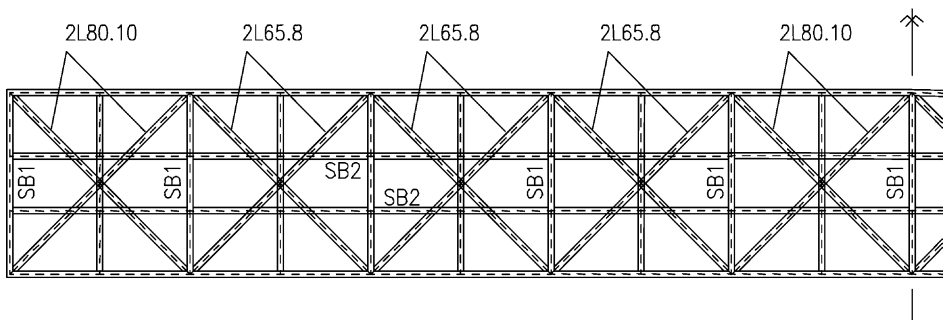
Horizontal bracing system in the bottom chord and secondary beams (SB1, SB2).
